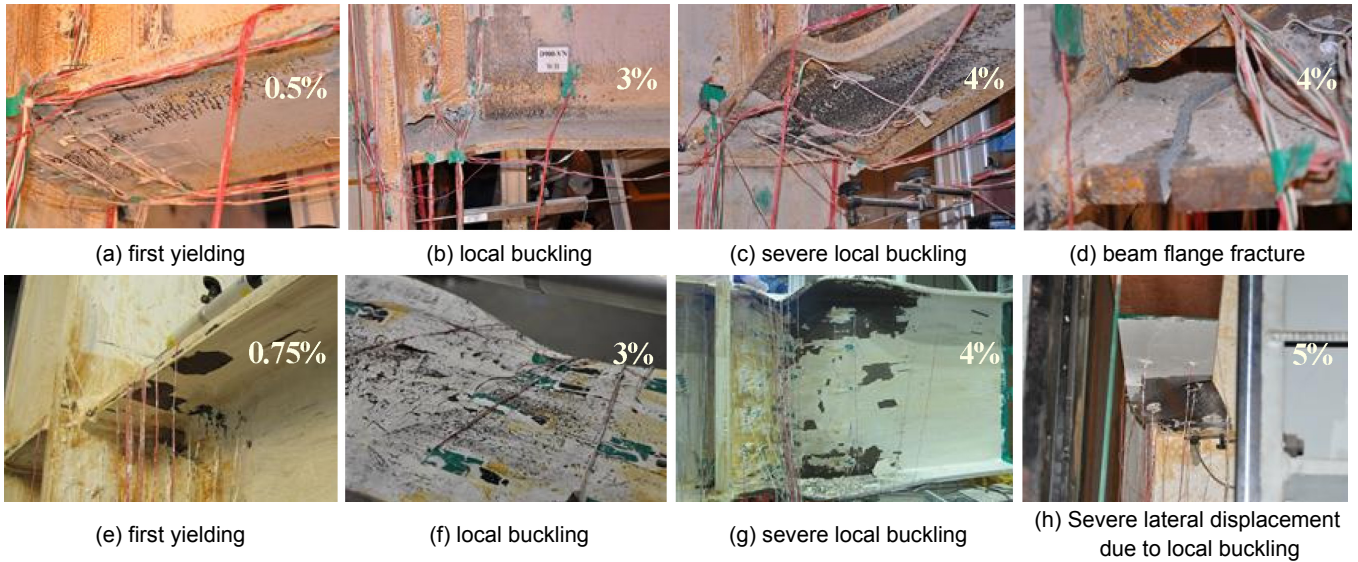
Fracture of specimens; (a-d)D900-S;(e-h)D900-S-A
